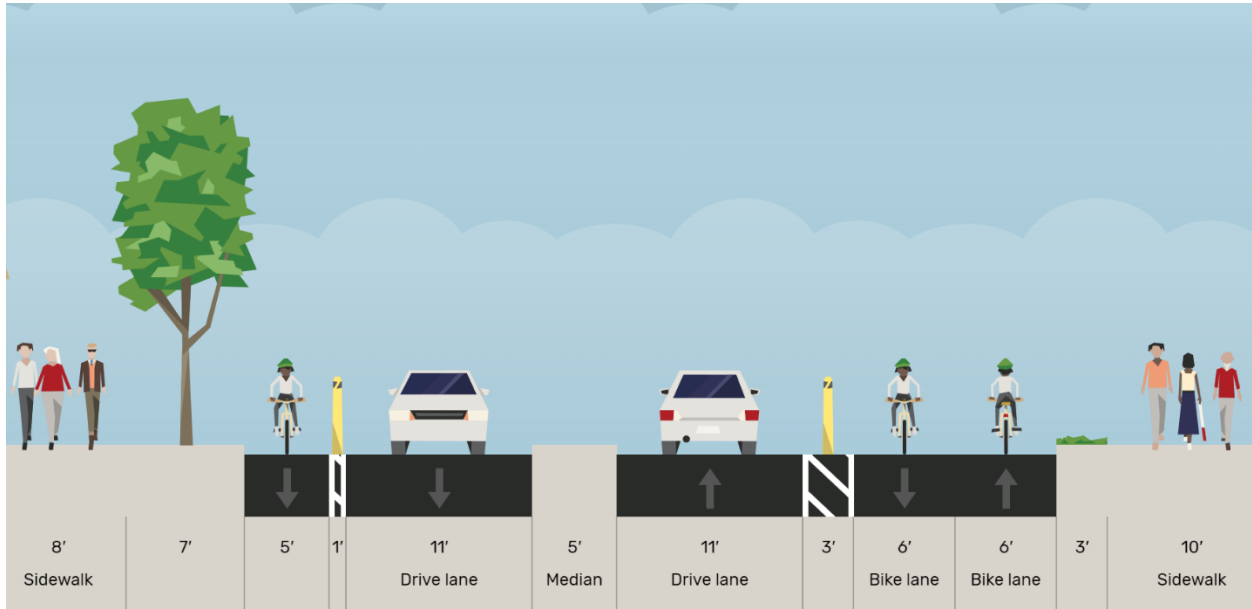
HOLLAND LANE CORRIDOR ALTERNATIVE 3 CROSS-SECTION FROM EISENHOWER AVENUE TO JAMIESON AVENUE
